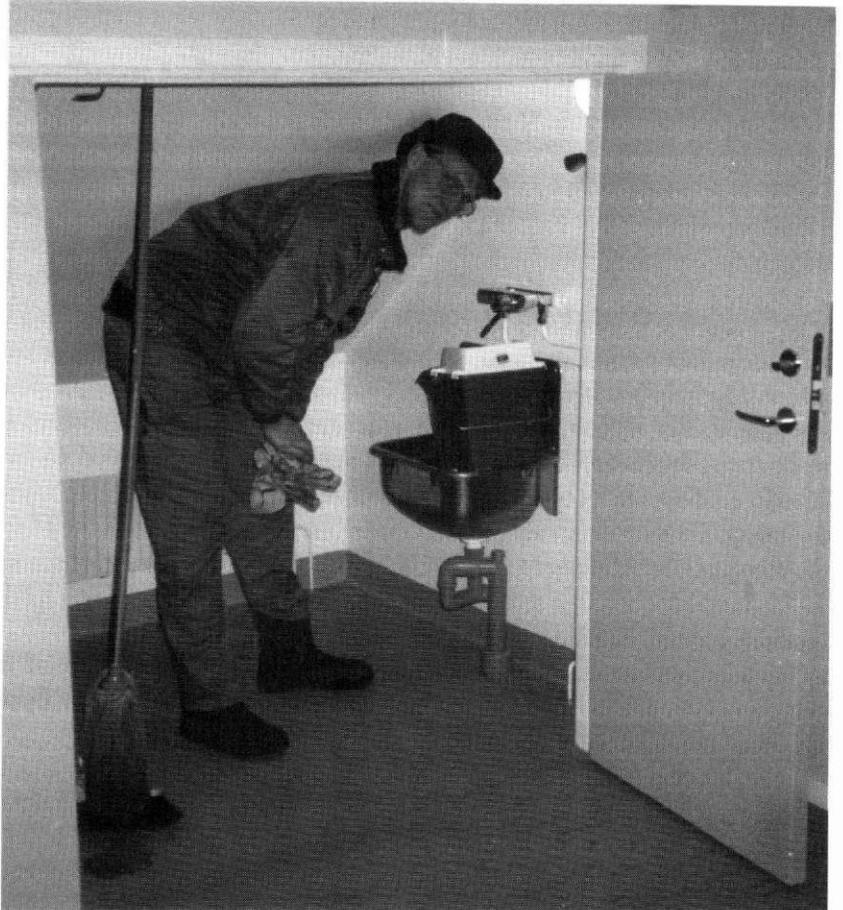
A cleaning room too low to stand straight in. The building is new. It just turned out that way.
